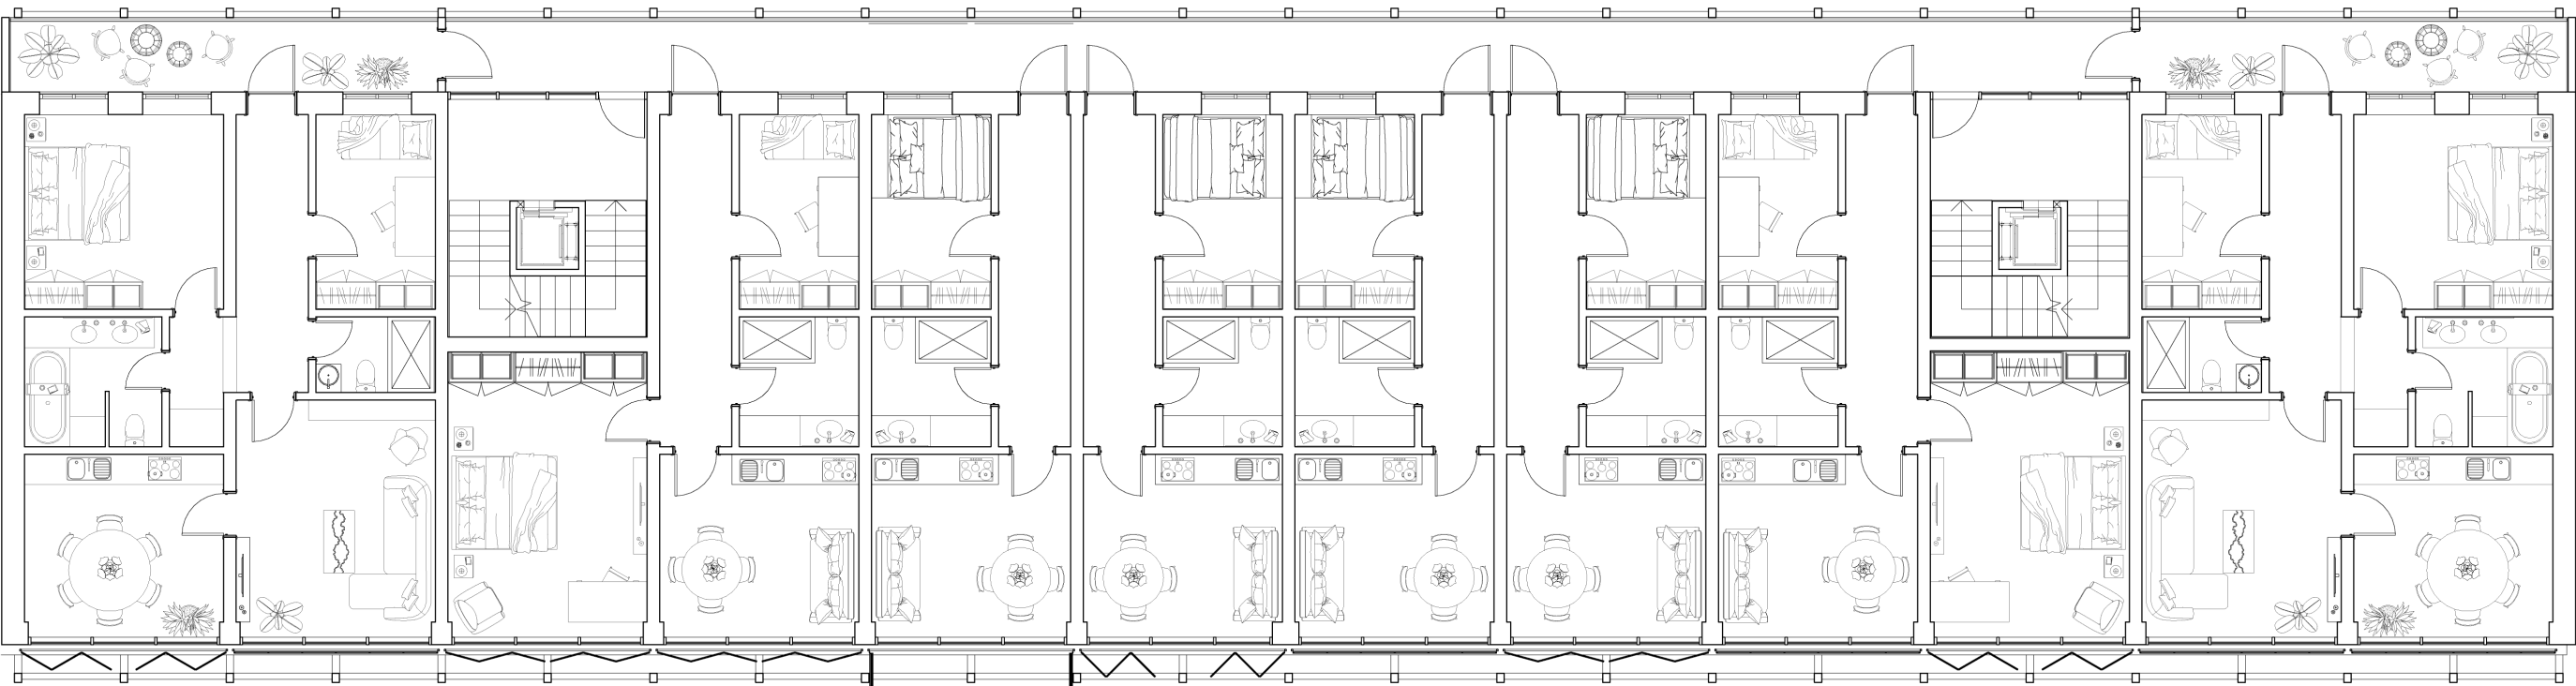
Third floor plan - Source: Lina Milovidova 2025
